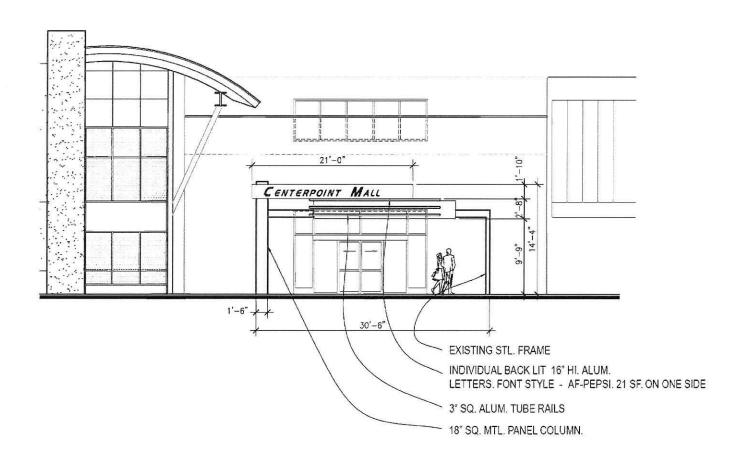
MALL ENTRY MARQUEE SIGN - ELEVATION
